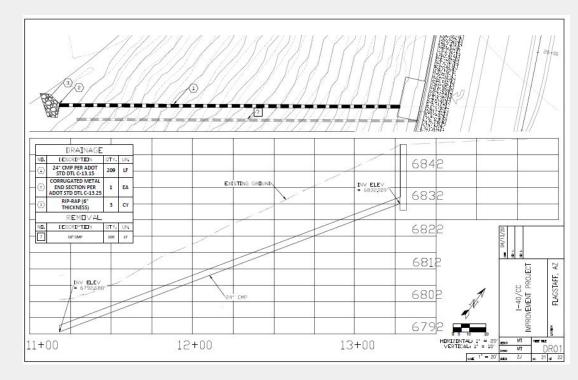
Storm Drain Pipe Plan Sheet Profile (NTS)
